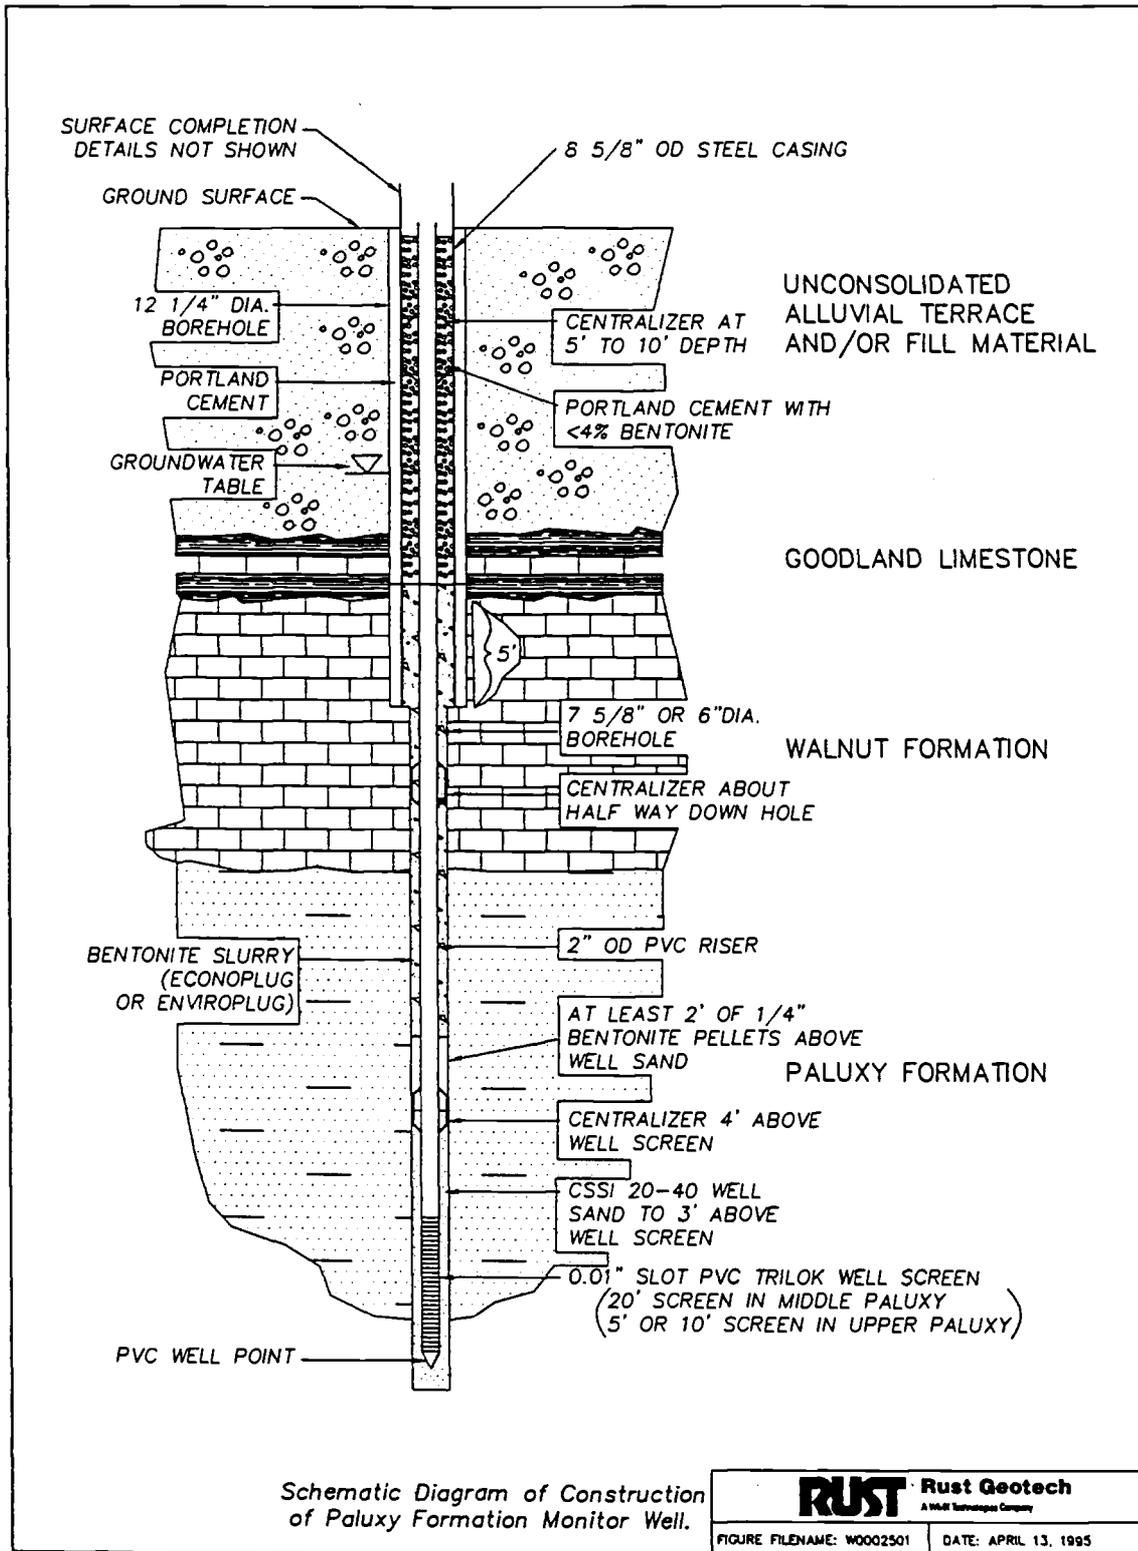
Schematic Diagram of Paluxy Monitoring Well Construction
